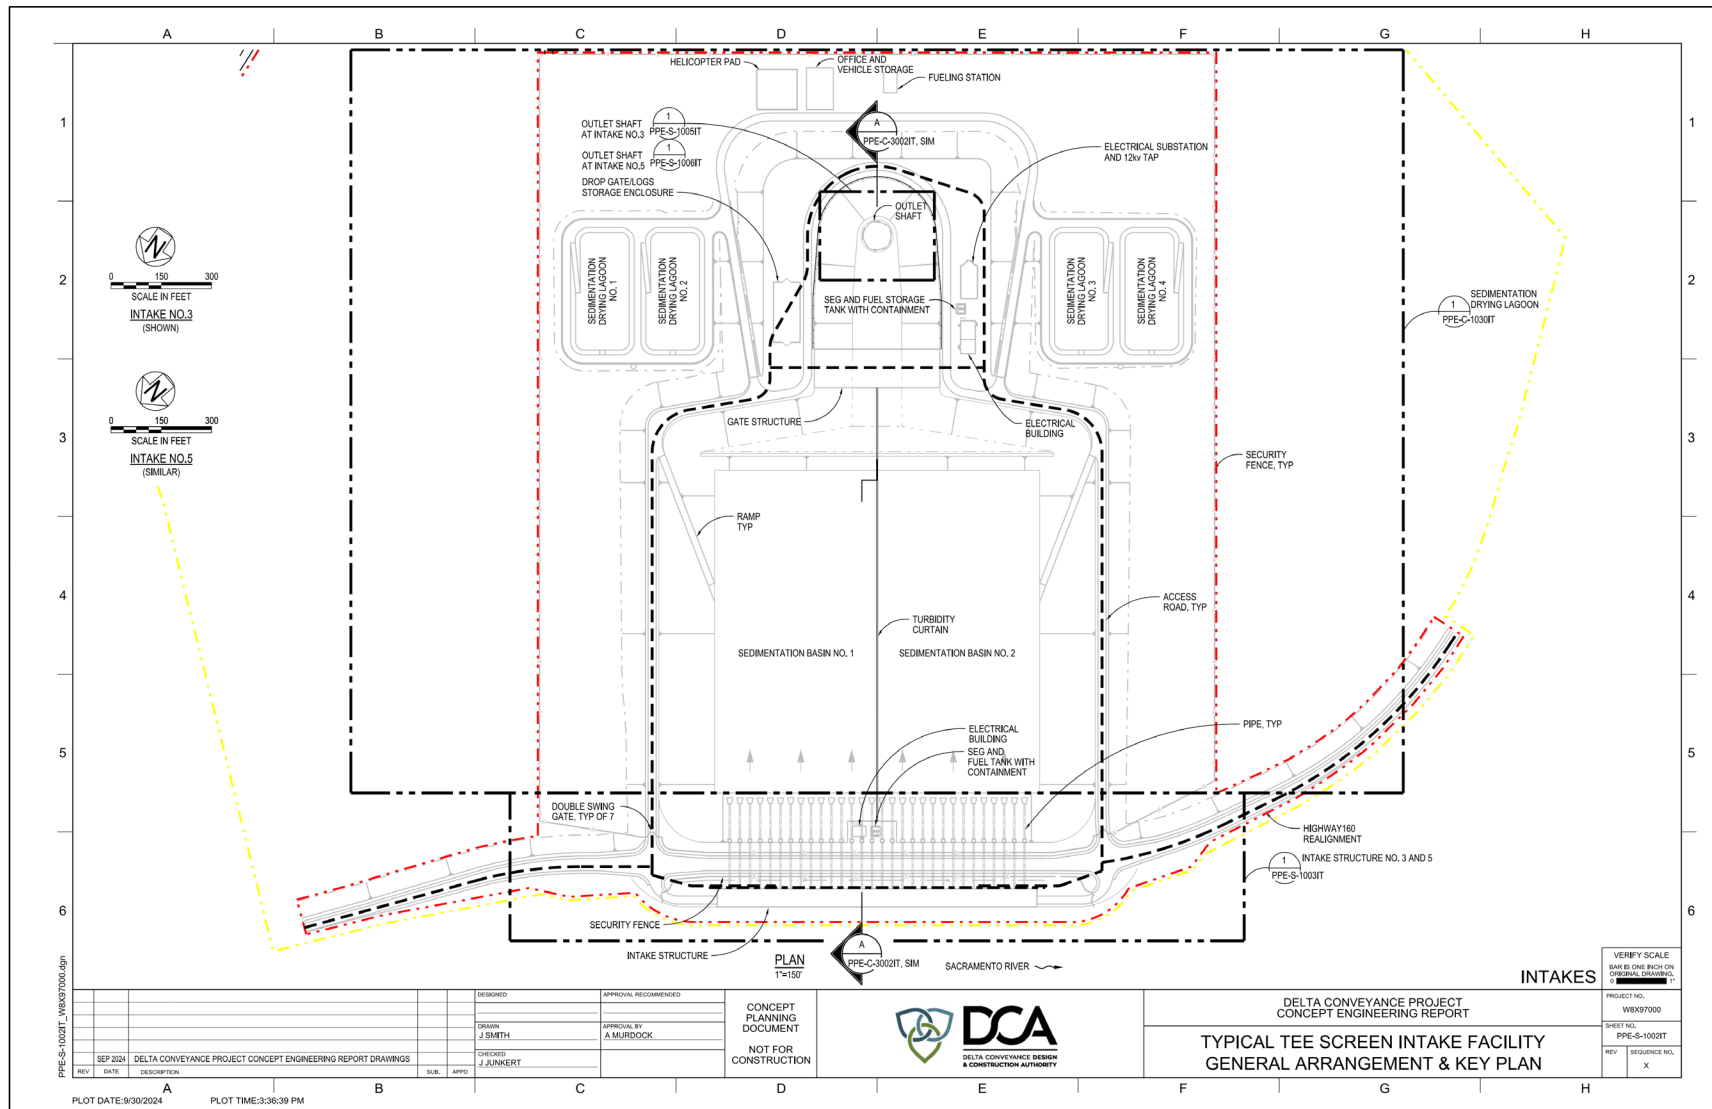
Typical Intake Facilities: Post-Construction Intake Site Plan with Cylindrical Tee Fish Screens
